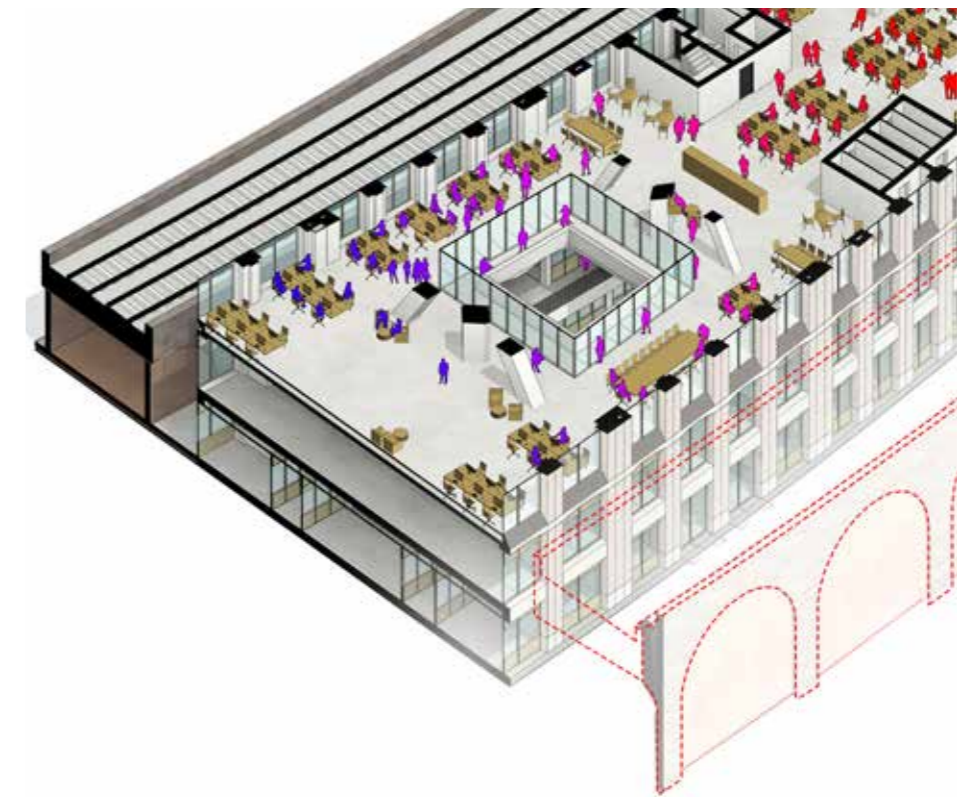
Publicly Accessible Open Space illustrative second floor axonometric diagram
